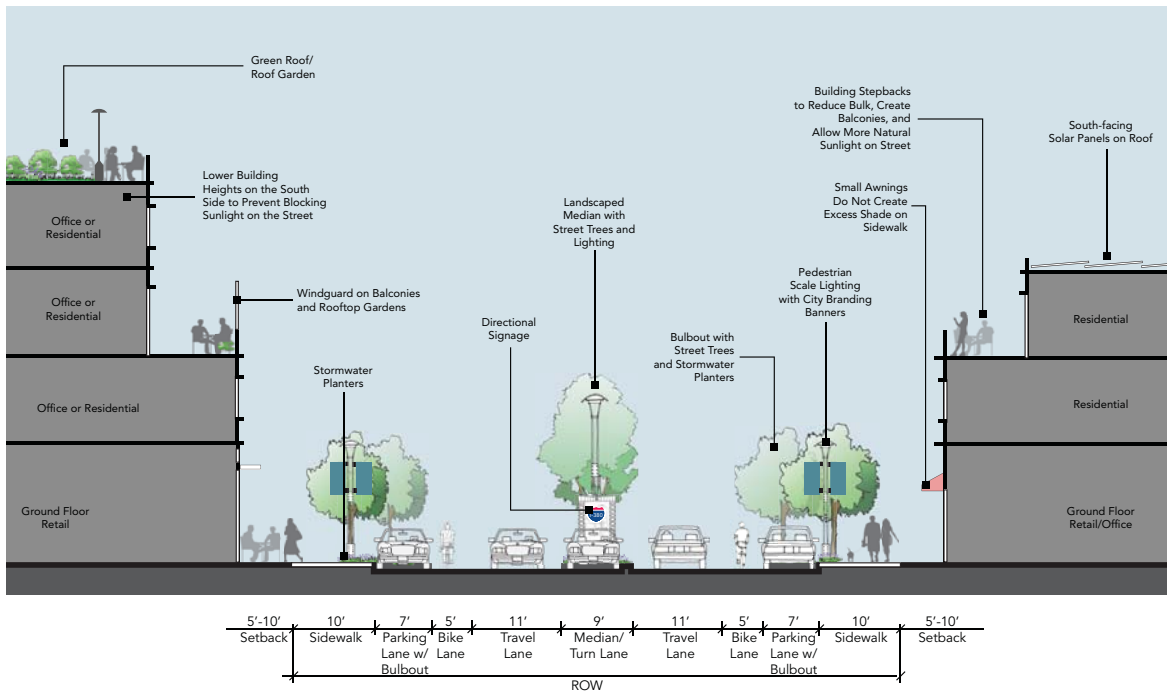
Proposed Improvements (San Bruno Avenue facing East between El Camino Real and Huntington Avenue)
